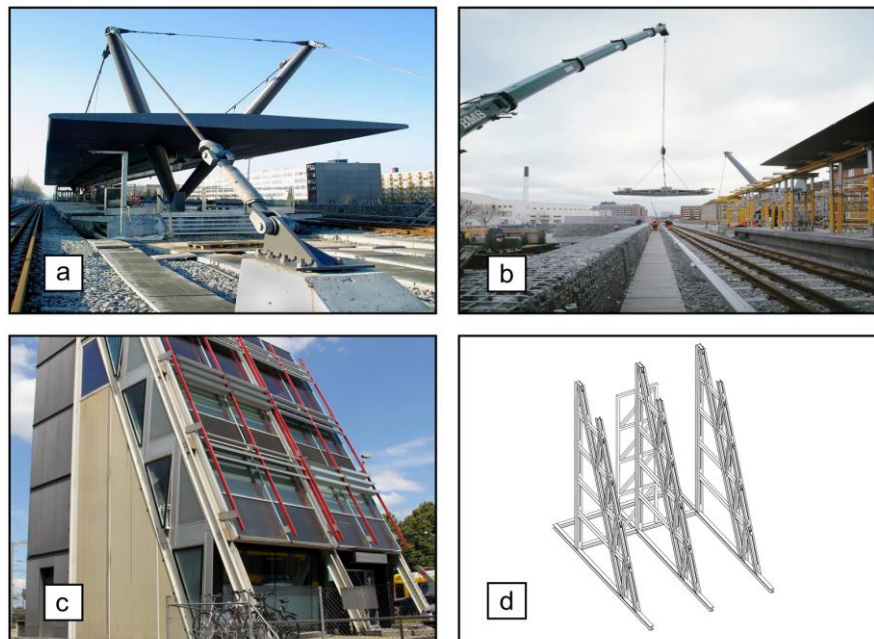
Lindevang suspended deck cover: (a) general view, (b) during installation process [2.19]; Eyecatcher building: (c) general view, and (d) sketch of GFRP frame structure [2.31].
